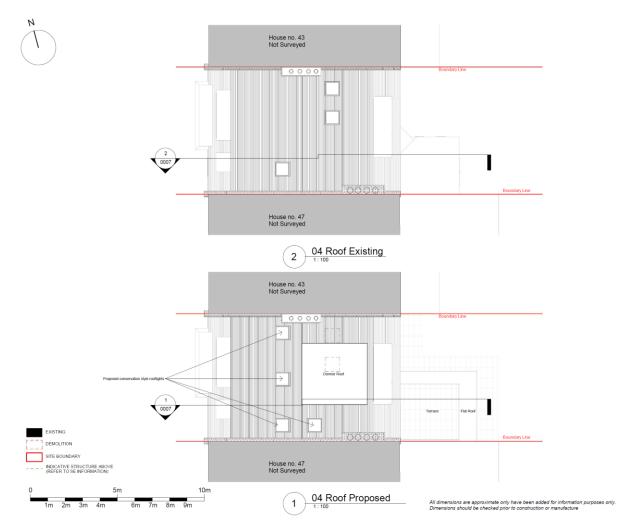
Existing and proposed roof plan (Source: submitted documents)
